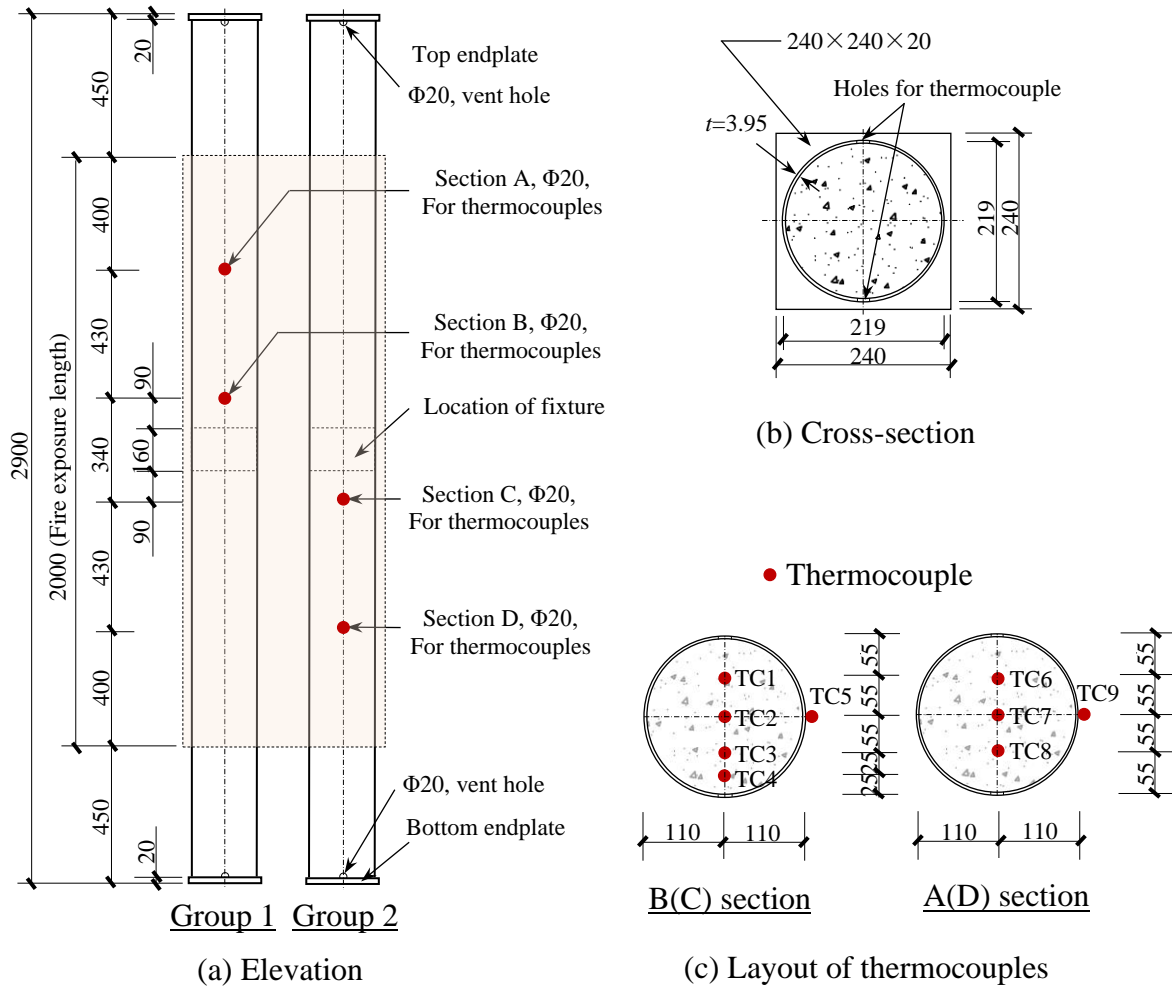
Specimen details and layout of thermocouples (unit: mm)
